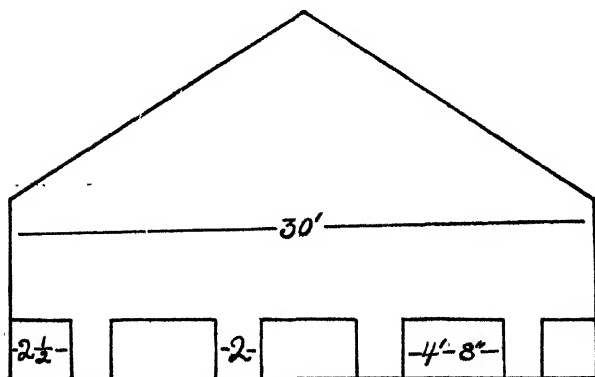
Another arrangement of benches in a 30-foot house. By this arrangement $73\frac{1}{3}$ per cent of the floor space is available for growing crops.
